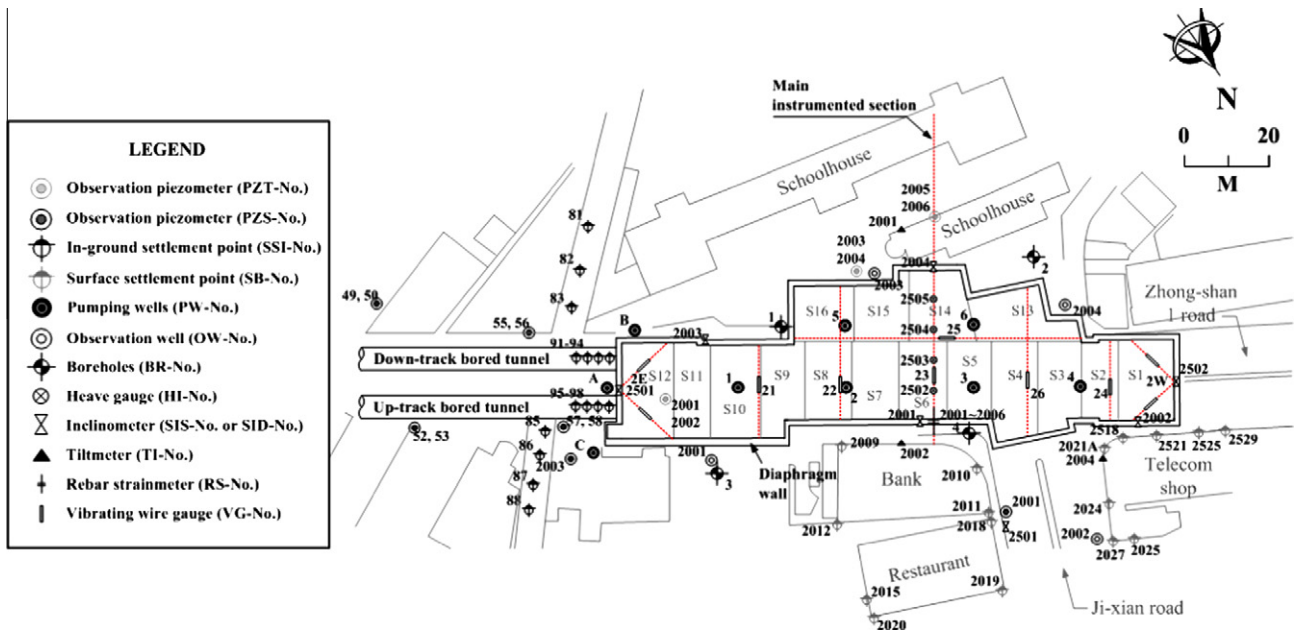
Plan view of the station box and layout of monitoring instruments (after Ni and Cheng, 2011).
